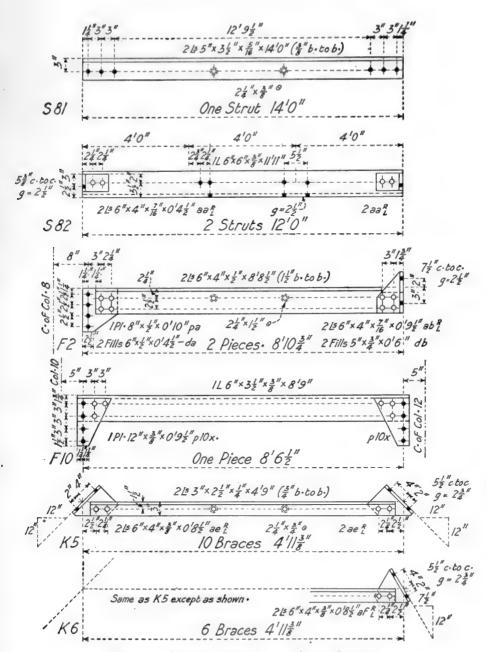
STANDARD DETAILS FOR ANGLE STRUTS.
